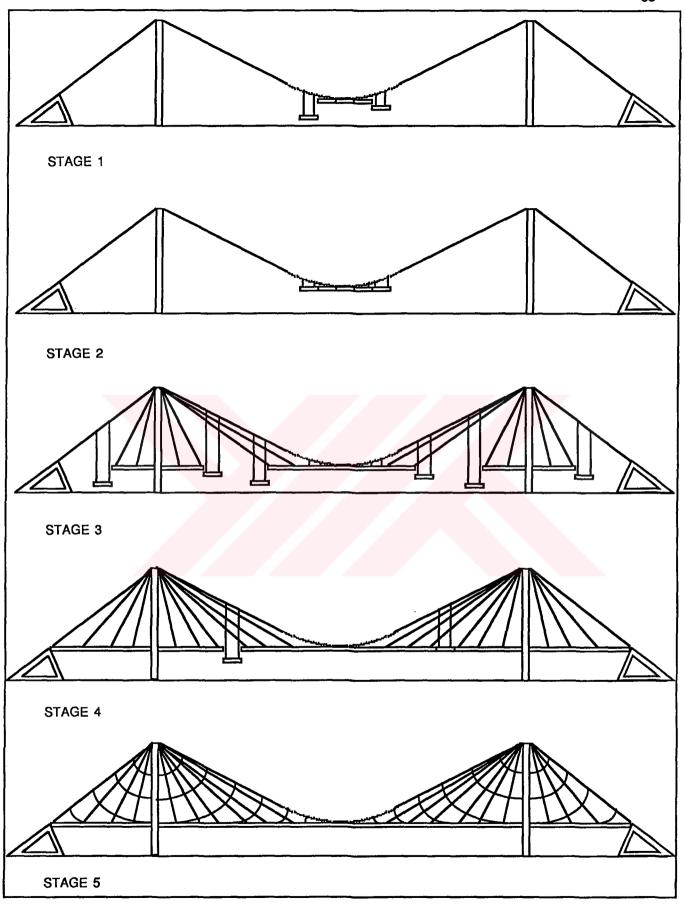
ERECTION PROCEDURE FOR A CABLE NET BRIDGE
